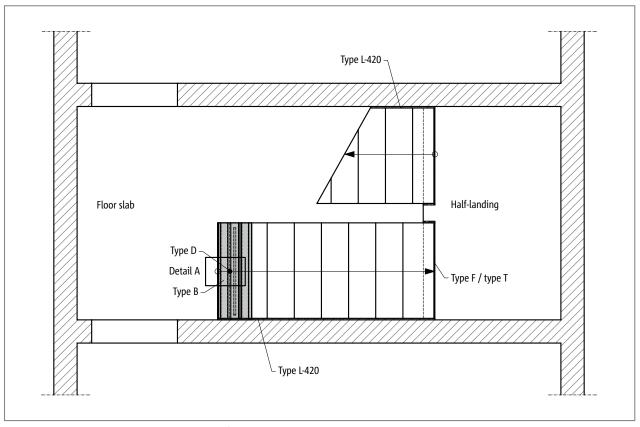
Schöck Tronsole®Type B + type D: Element configuration in plan view
